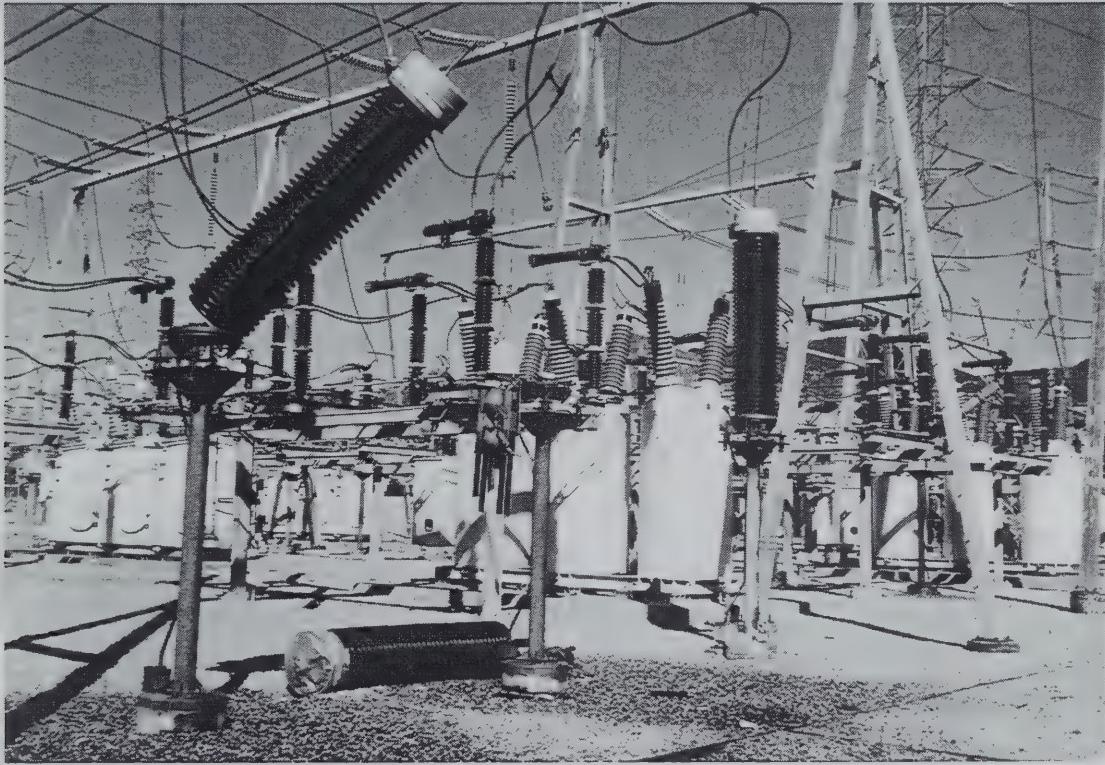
Four of six potential transformers supported on more flexible support columns and with Belleville washers failed. The less massive current-voltage transformers supported on stiffer columns and with Belleville washers were undamaged.
